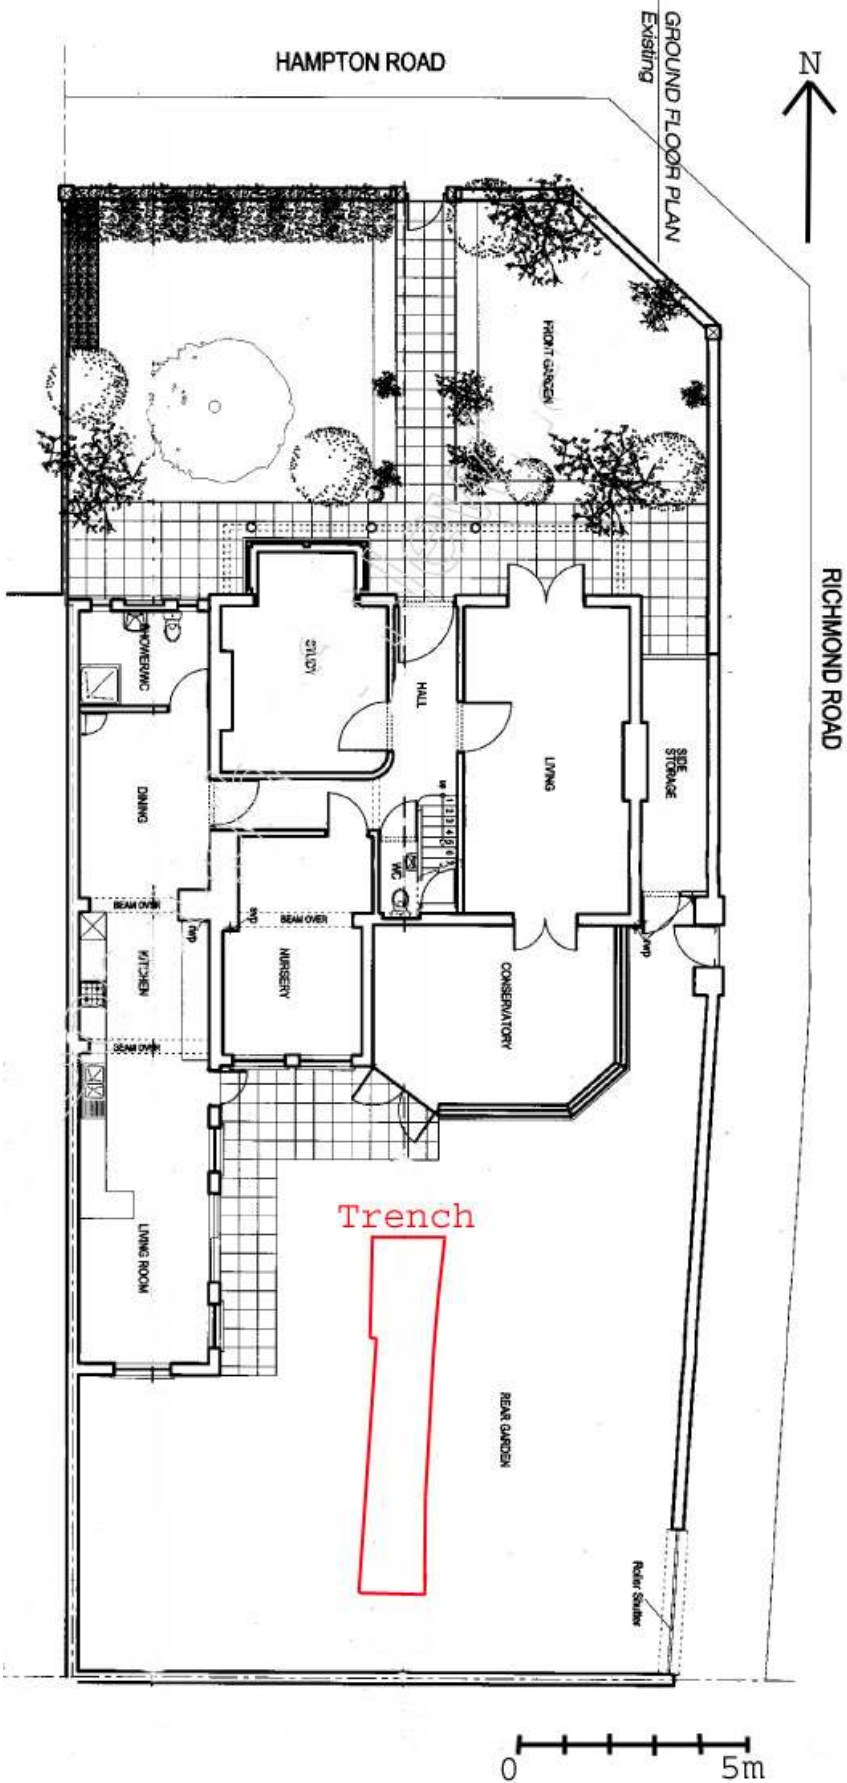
Plan of the trench location. (Original plan from Blanchard Consulting Ltd).
